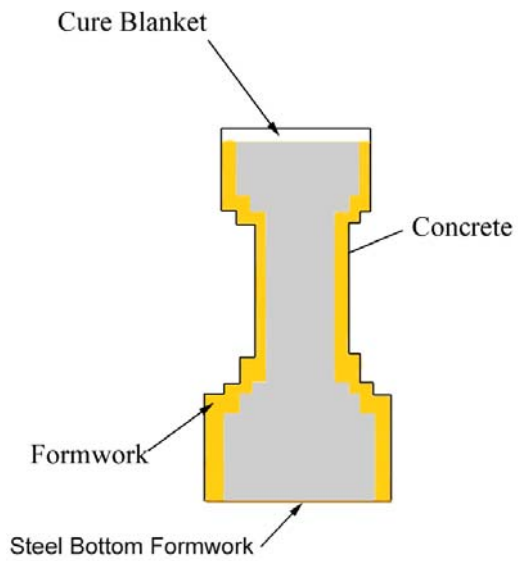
Precast type IV beam model assumed in ConcreteWorks
